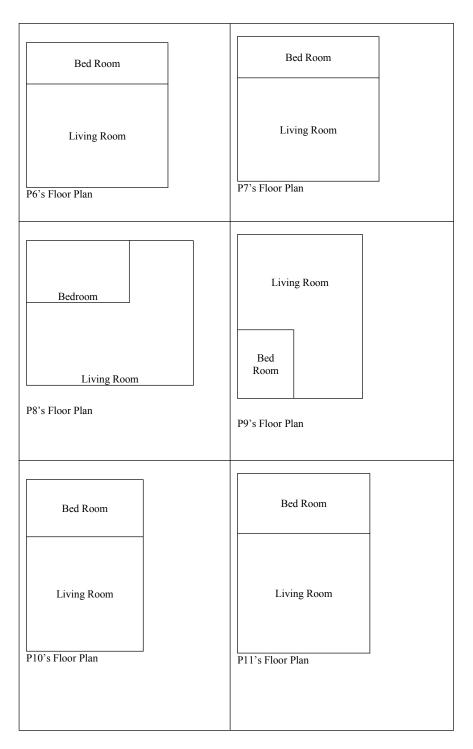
Floor Plan of P6, P7, P8, P9, P10 and P11 (Source: Survey 2014)
